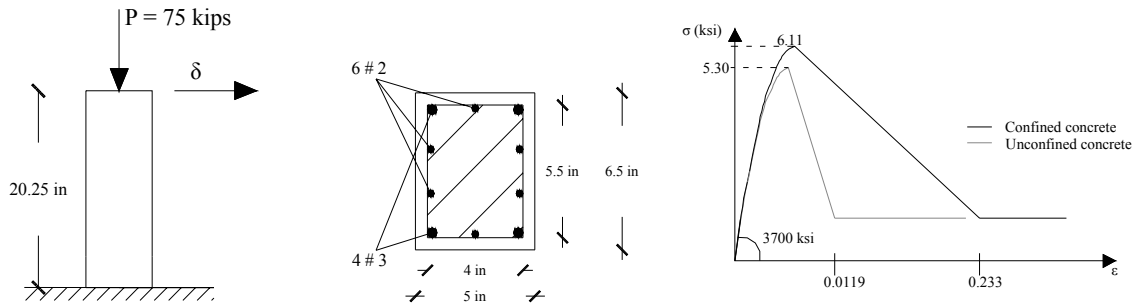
RC cantilever beam-column with strain-softening section response and material properties
